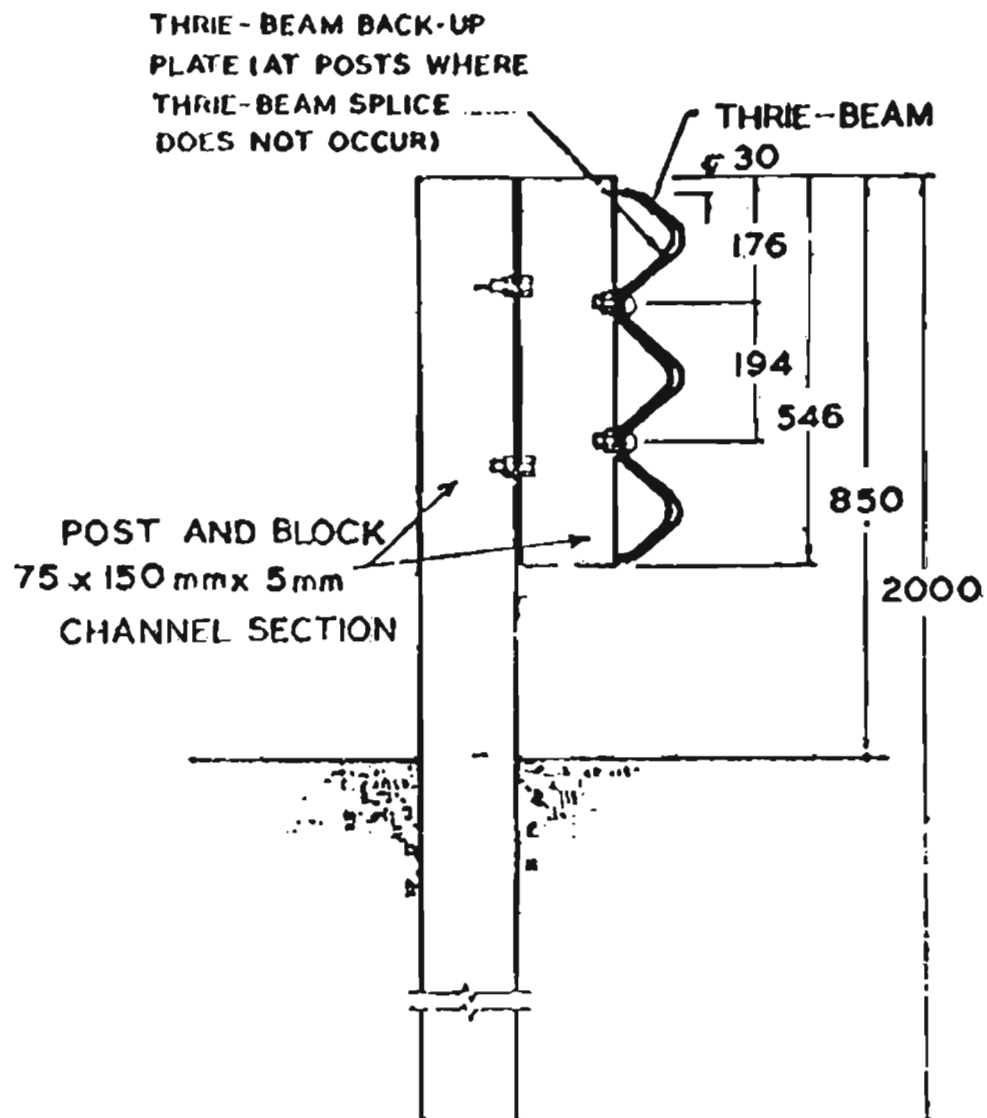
TYPICAL DETAILS OF THRIE BEAM SECTION
